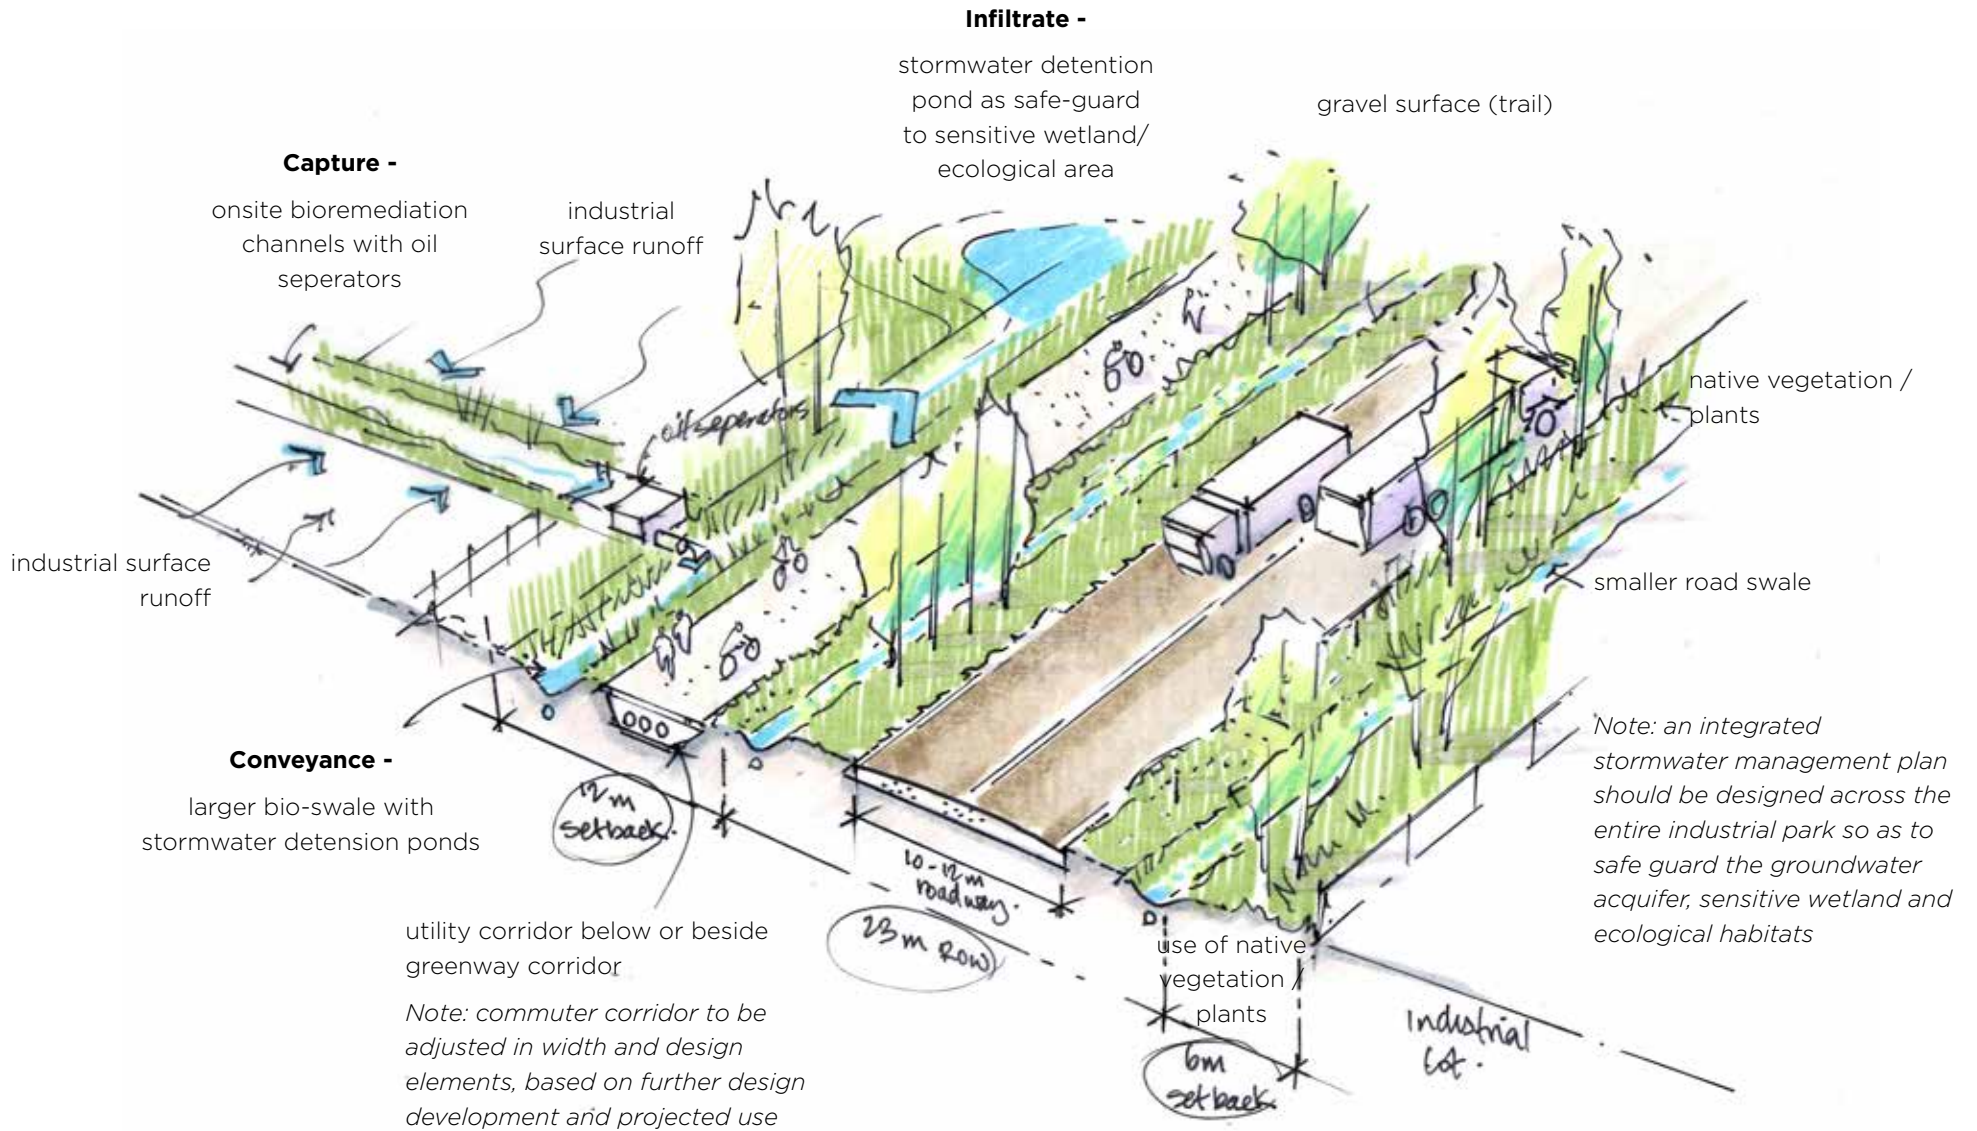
FIGURE: Proposed Bevan Road cross section and servicing with integrated stormwater management.
